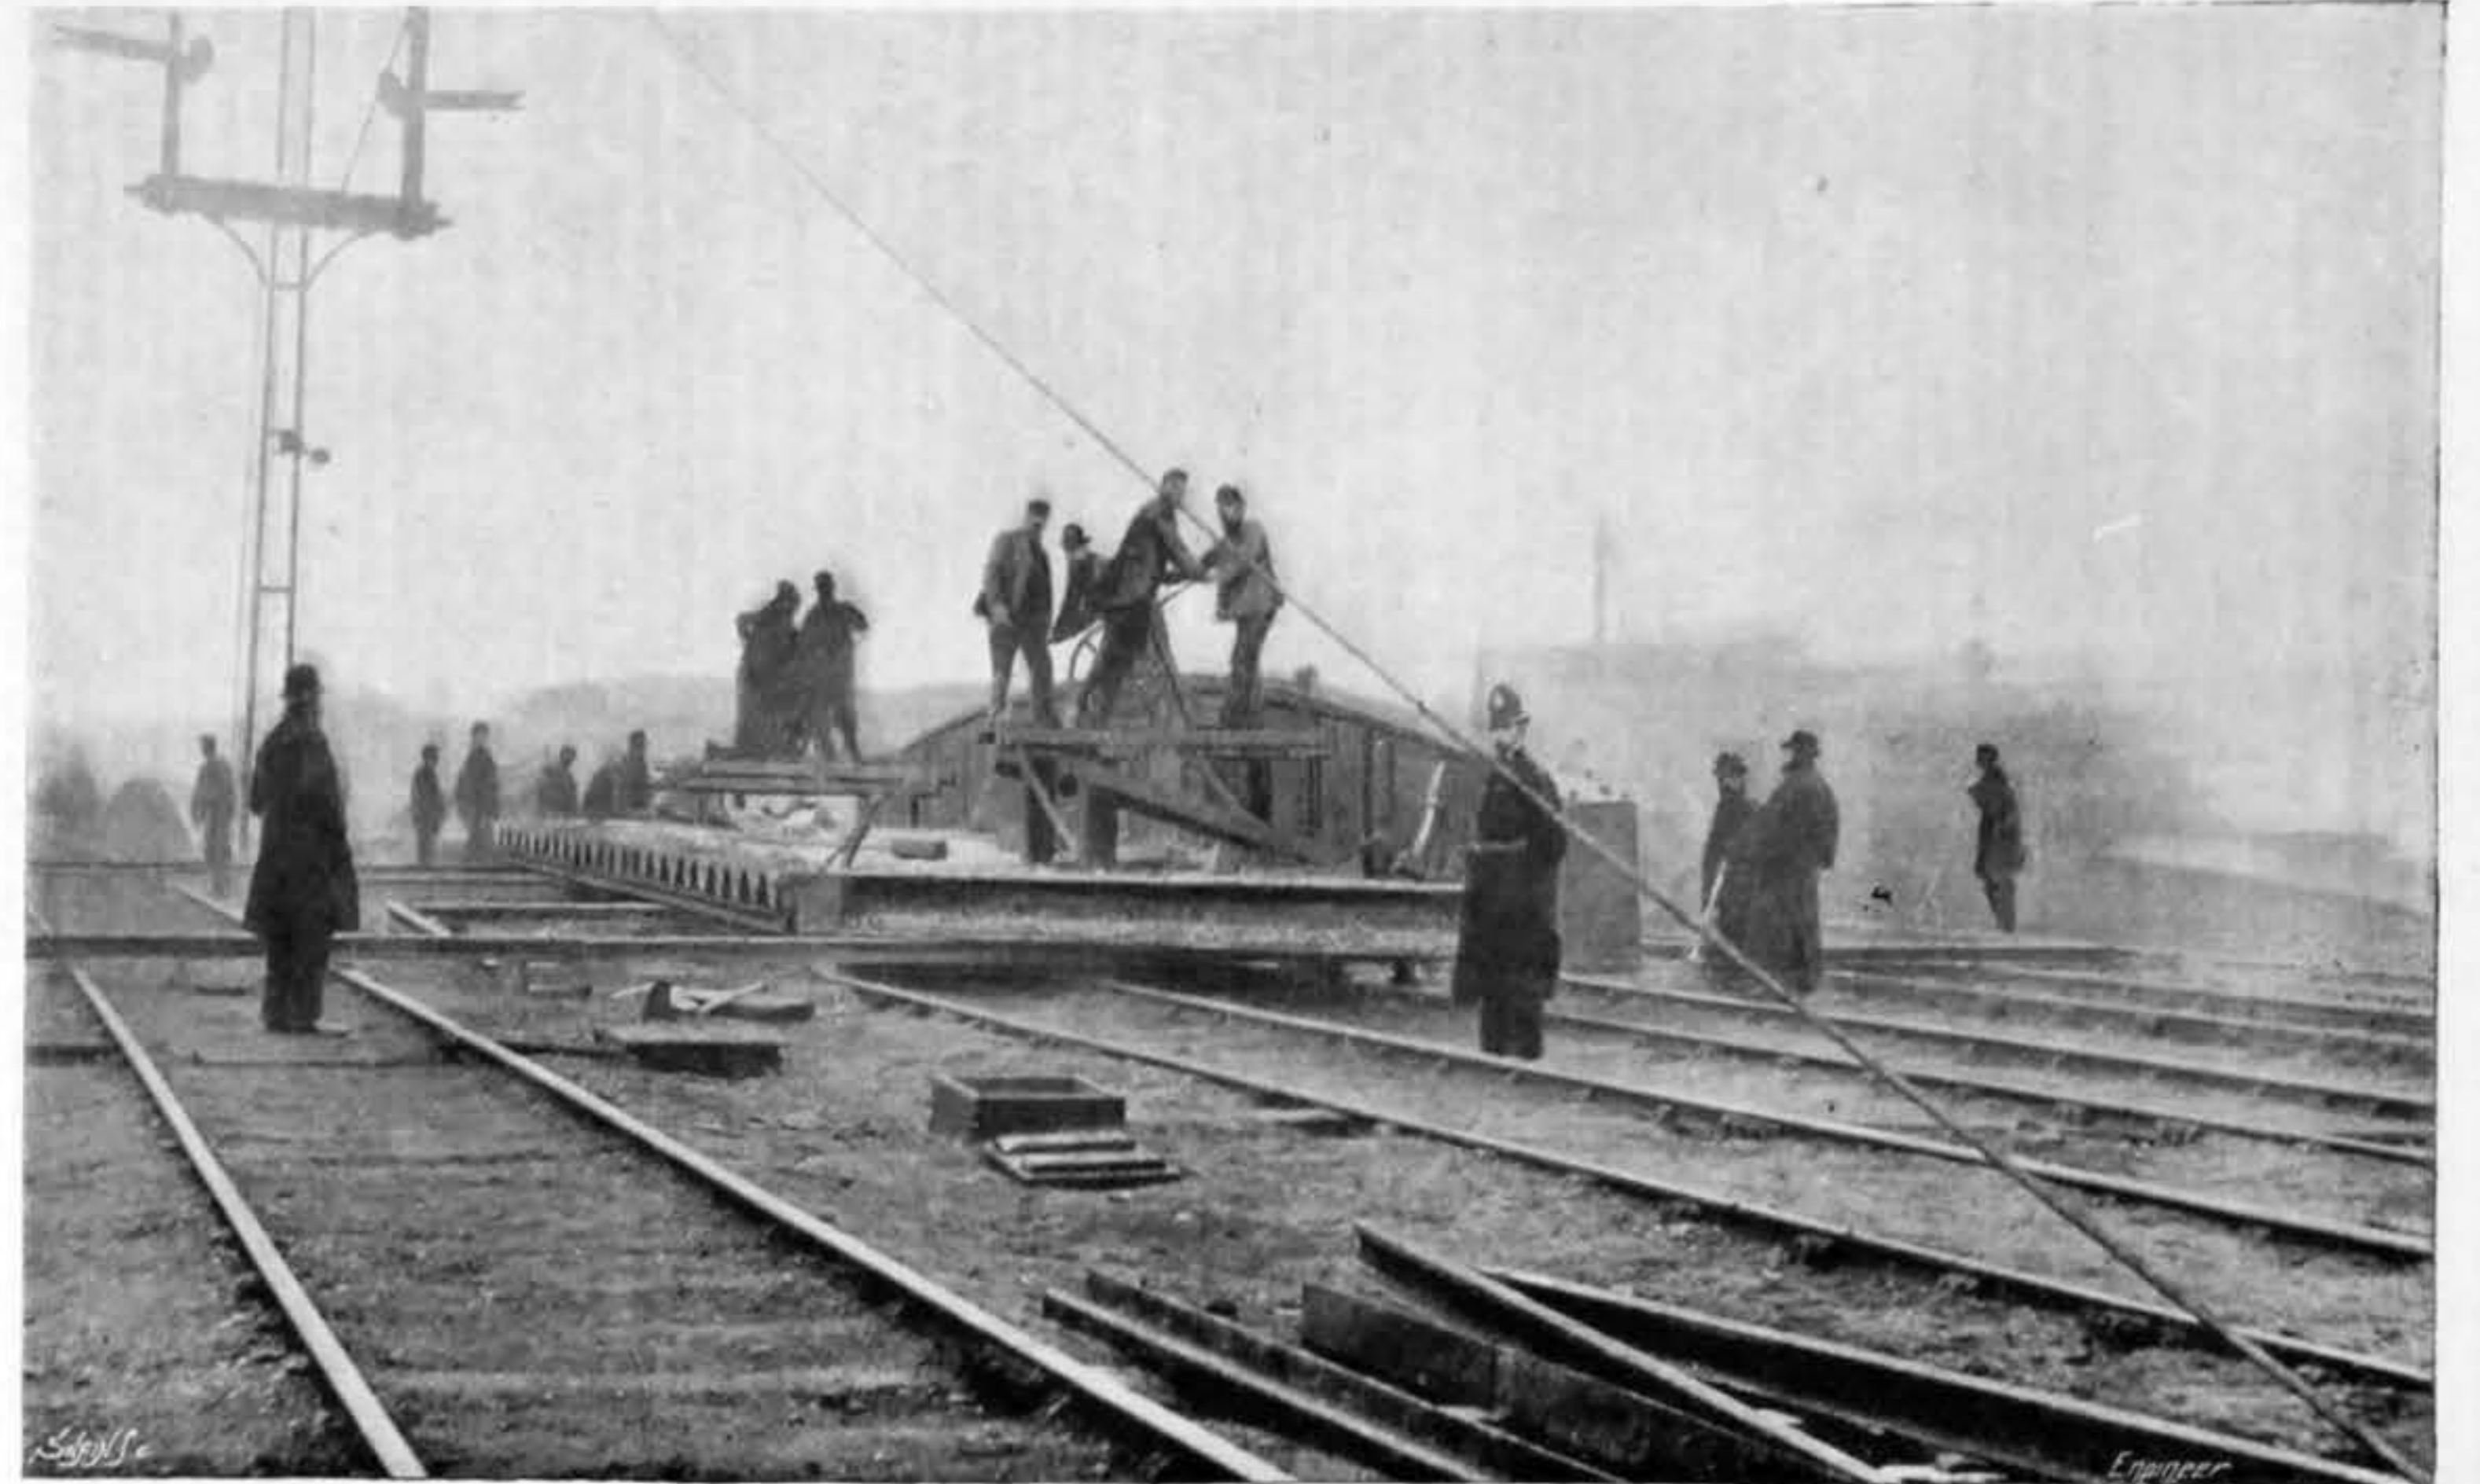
HAULING A SECTION OF THE BRIDGE TO ITS BEARINGS, FIRST OPERATION
